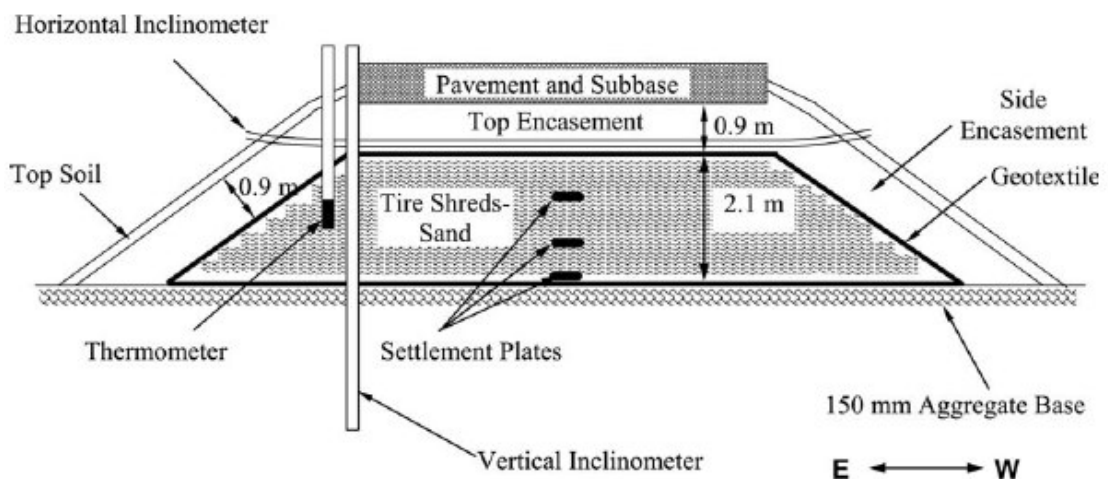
Schematic cross-section of an embankment constructed with tire shreds and sand (Yoon et al., 2006)
